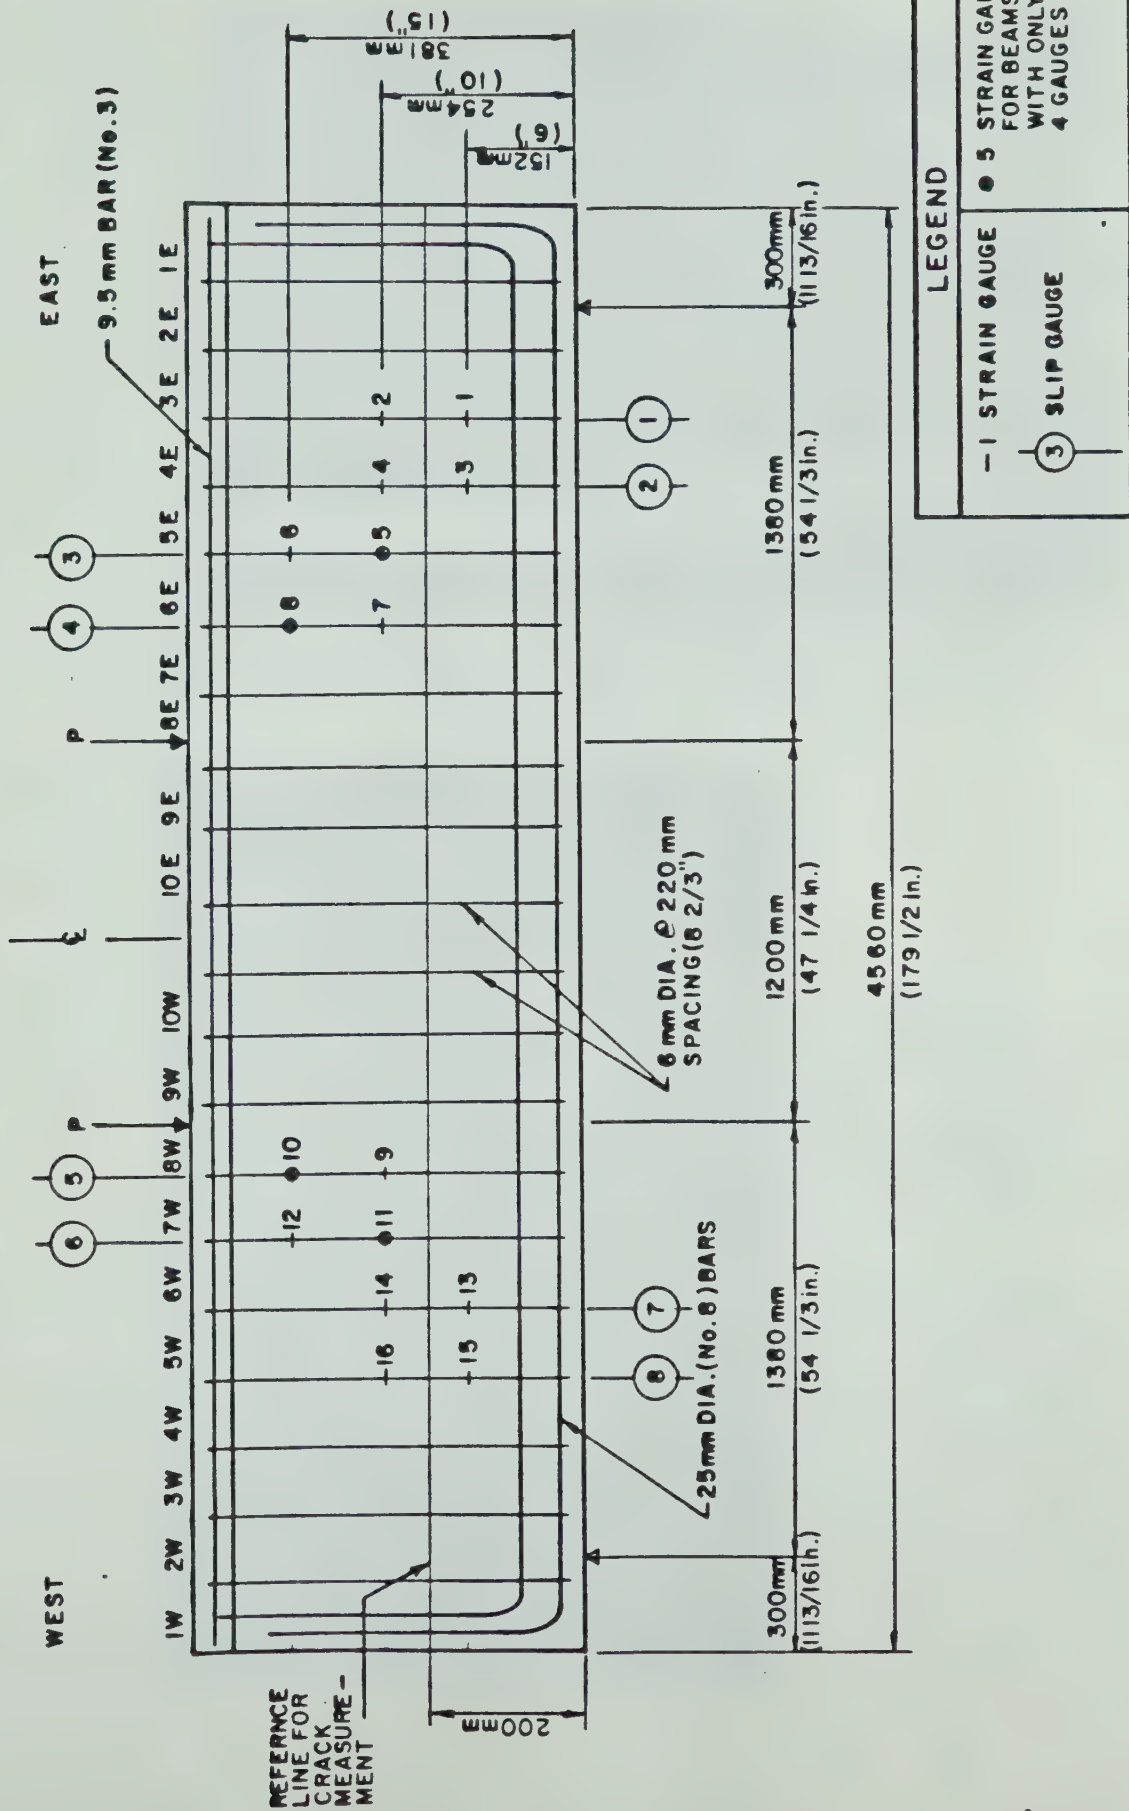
Locations for Instrumentation for Beams with Conventional 6 mm Diameter Stirrups (Not to Scale)
